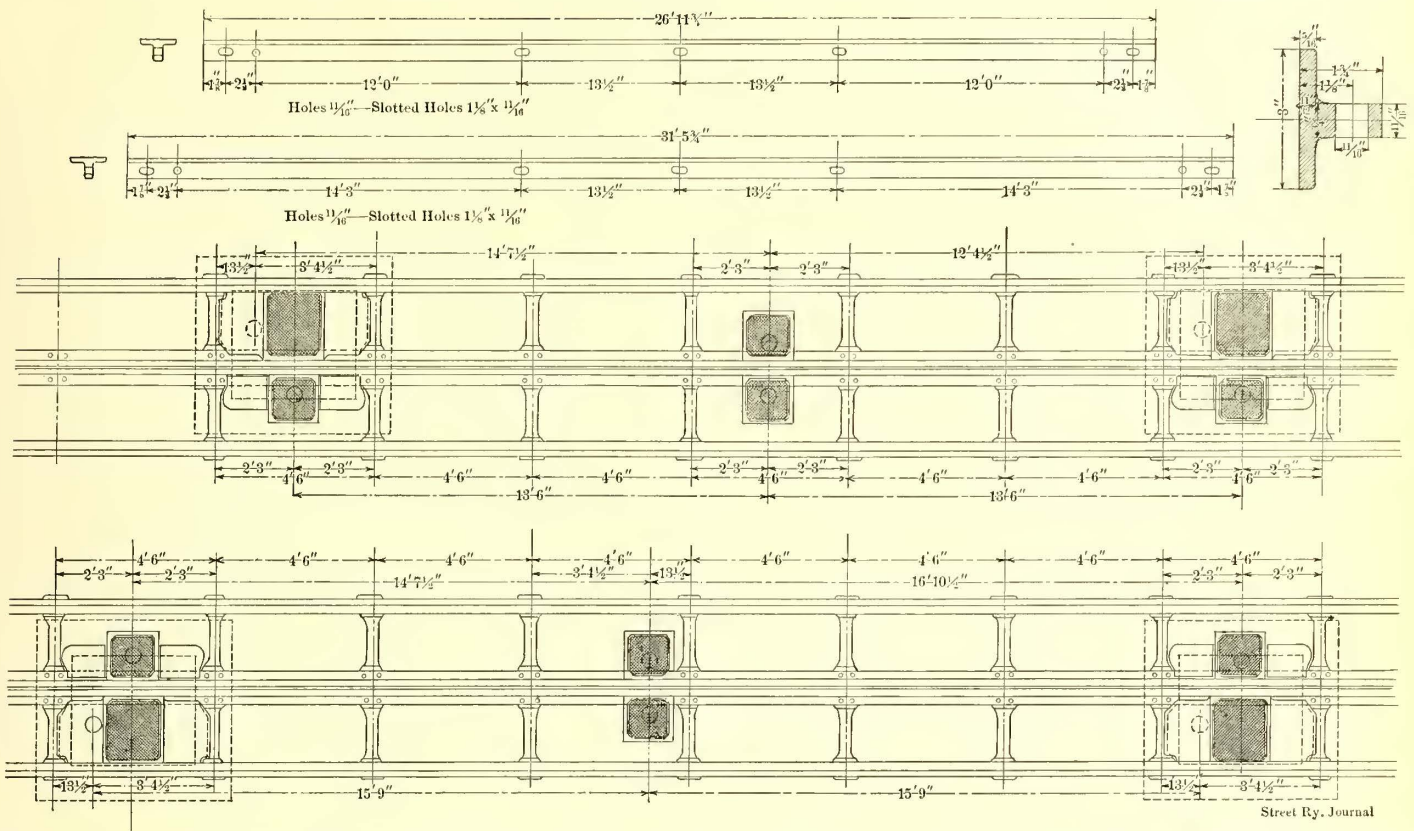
SECTION AND PLAN, SHOWING BROADWAY CONDUIT, ELECTRICALLY EQUIPPED
